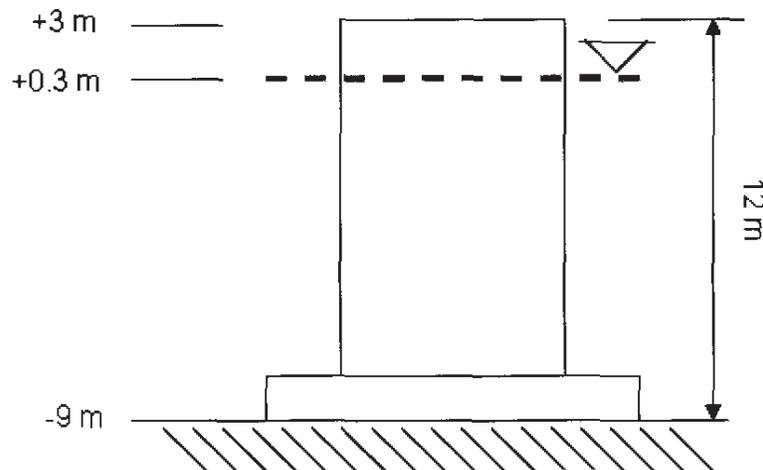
Stage 3 of Sunken 12 m Caisson to Elevation -9 m
